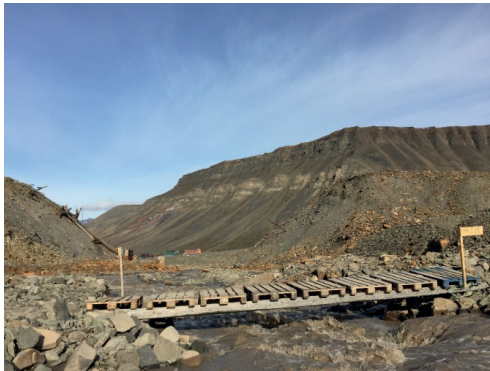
A hand-built bridge over Longyear river. Photo credit: Julia Olsen.
